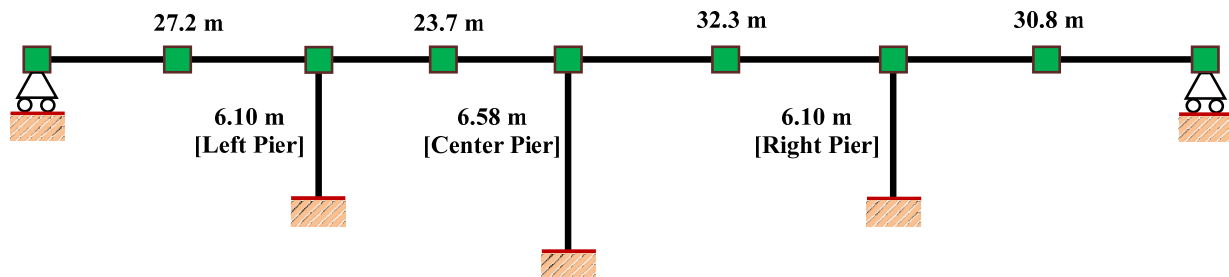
Layout of the Santa Monica Ramp Bridge (not to scale).
